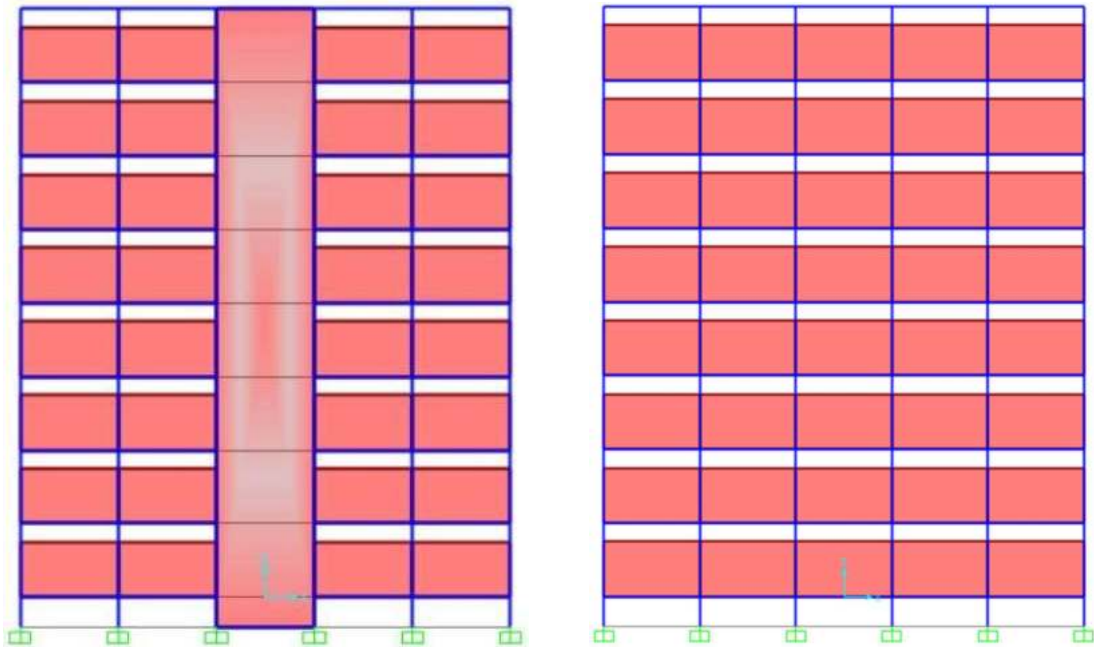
Elevation of 75% Partially in-filled frame with shear wall
